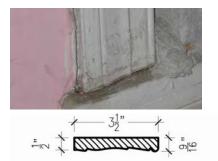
Window 104 case molding type-2 photo and profile. (Photo: BBB, 2007)
